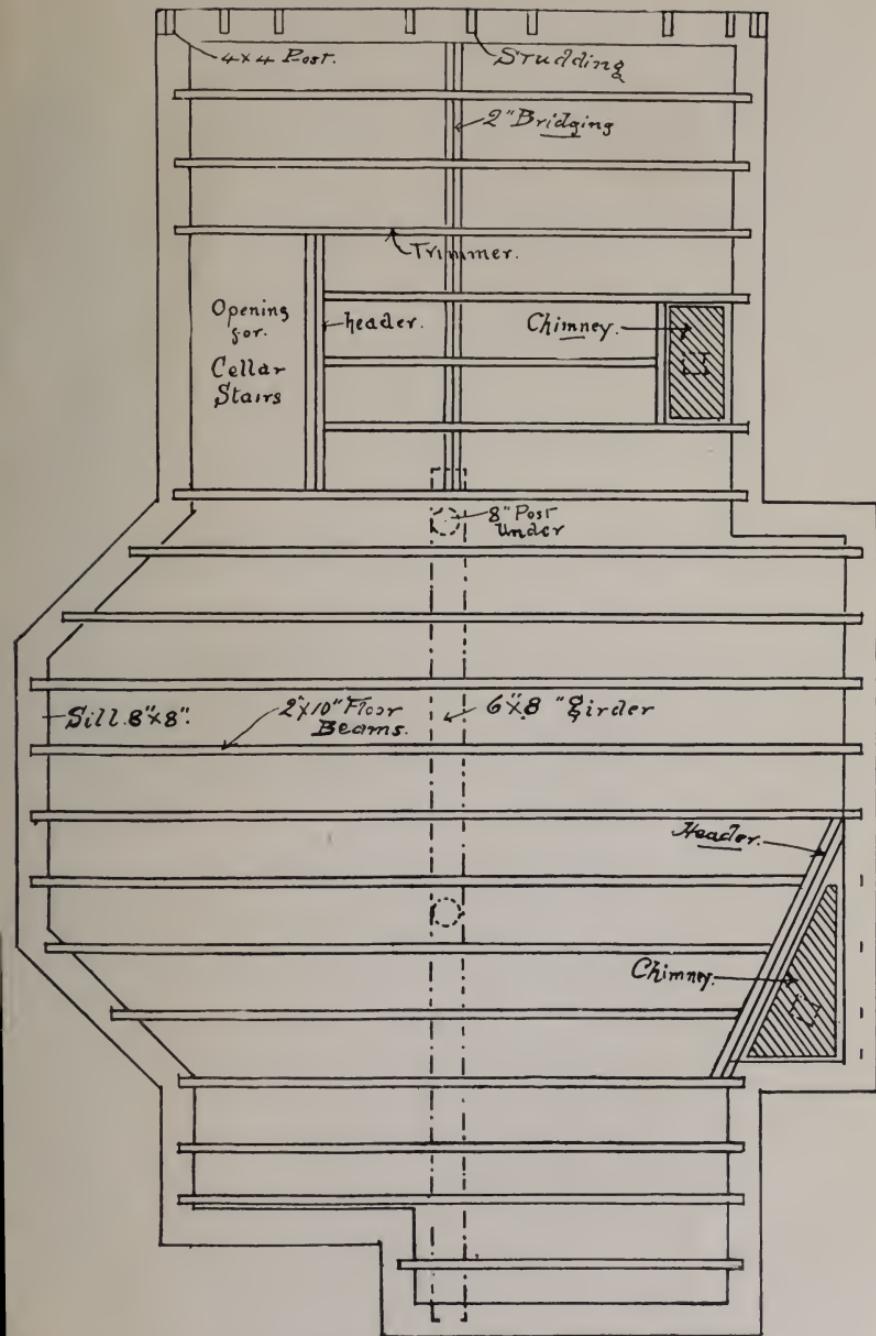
FLOOR PLAN OF FIRST STORY TIMBERS.
